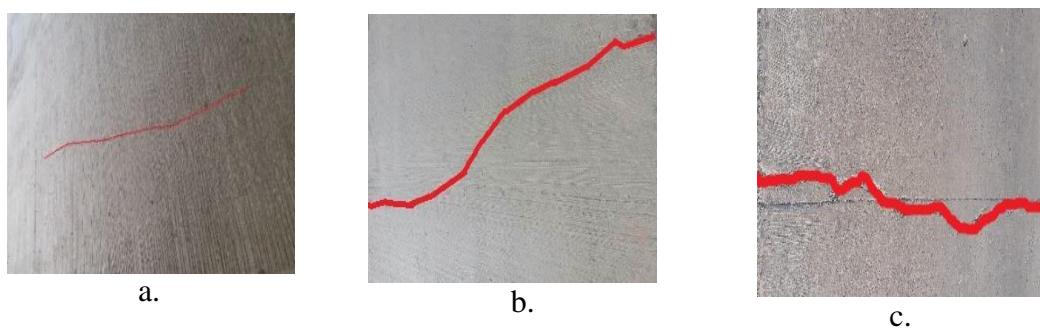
Shrinkage-crack propagation, a. after six months of construction, b. after one year of construction and c. after two years of construction
